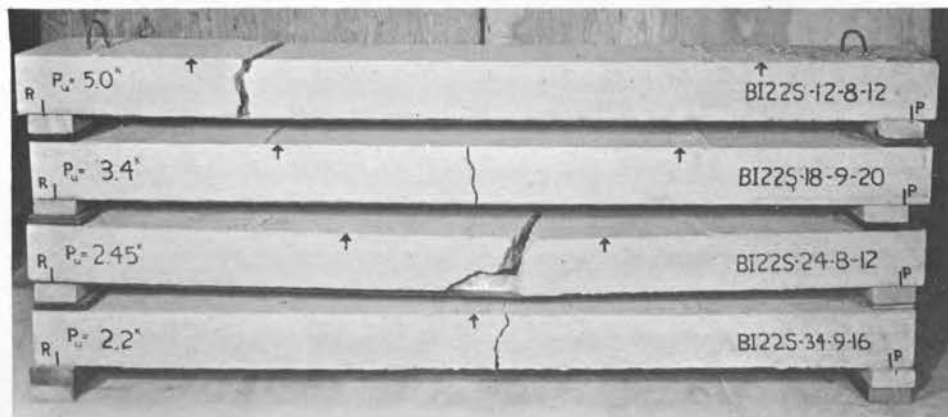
Failed beam specimens for casting numbers 8 and 9 using 22-gage smooth steel form I.
